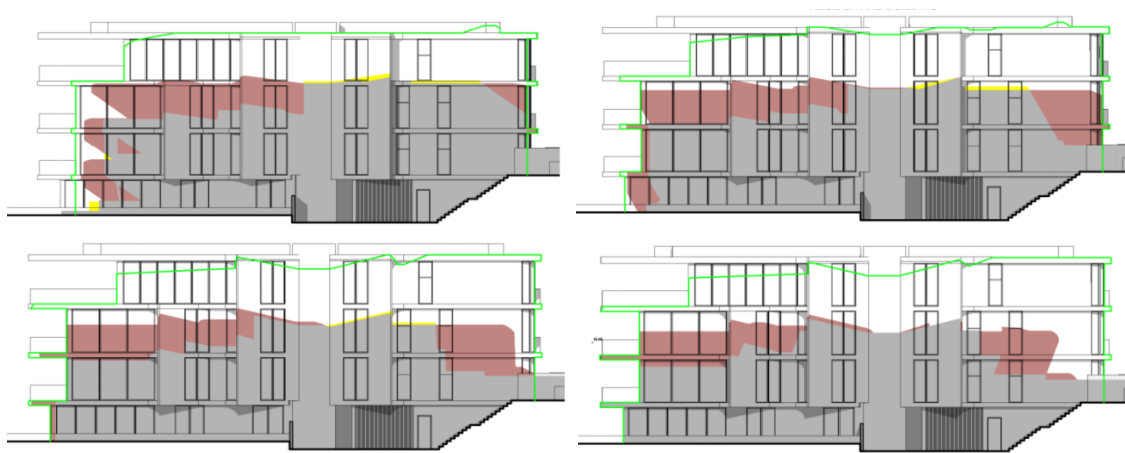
Elevation Shadow diagrams of no.68 at 10am – 1pm (Source: Roth Architects)
